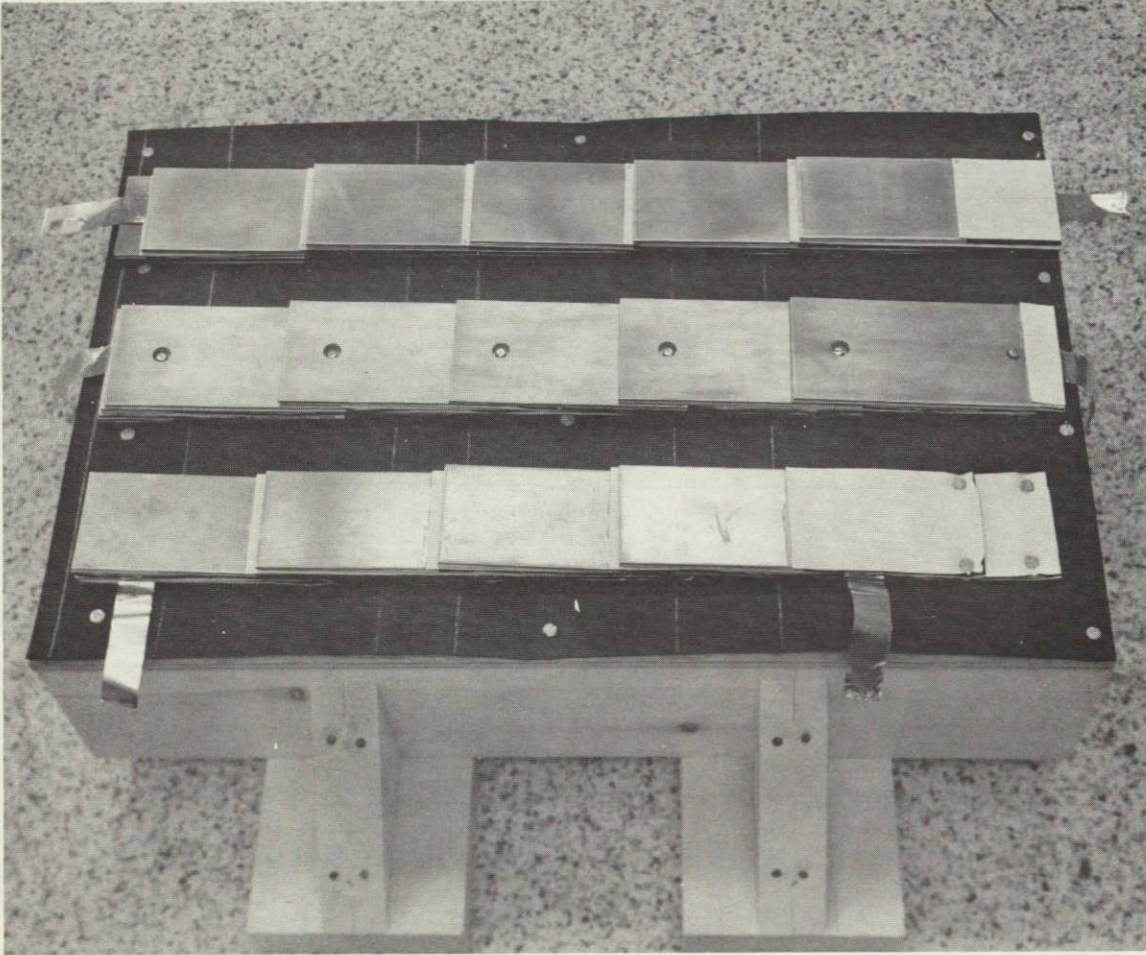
Simulated Shingles Mounted to Test Fixture
